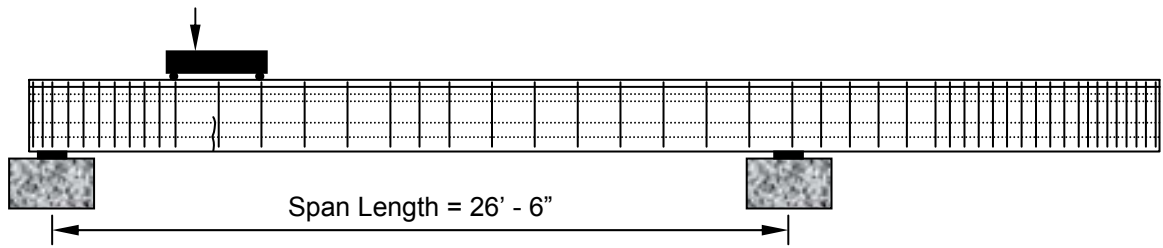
Crack Pattern at Cracking Load for STD-M-2E
